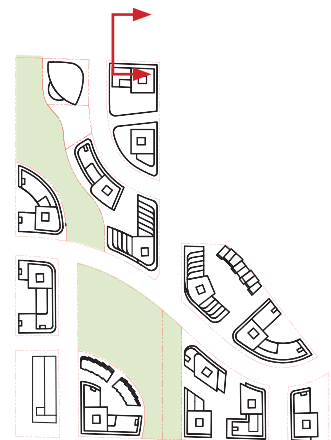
West 33<sup>rd</sup> Avenue Section
